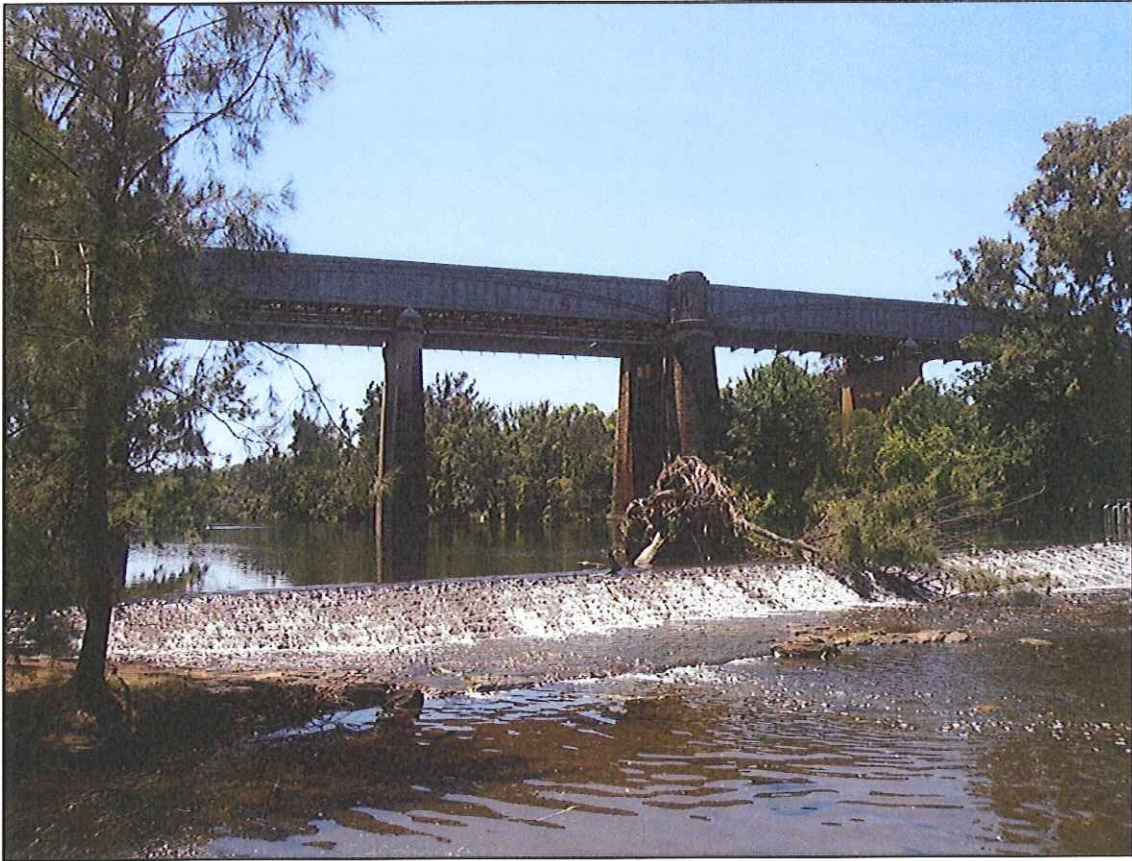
Western Elevation of Menangle Railway Bridge, December 2012
